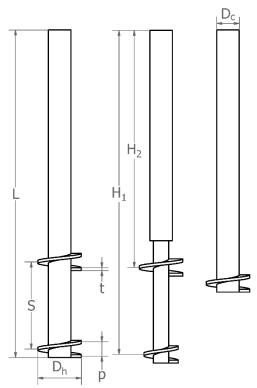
Screw pile designs used in centrifuge tests. Left: uniform double-helix, middle: optimised double-helix, right: uniform single helix. See Table 3 for description of symbols and dimensions.
